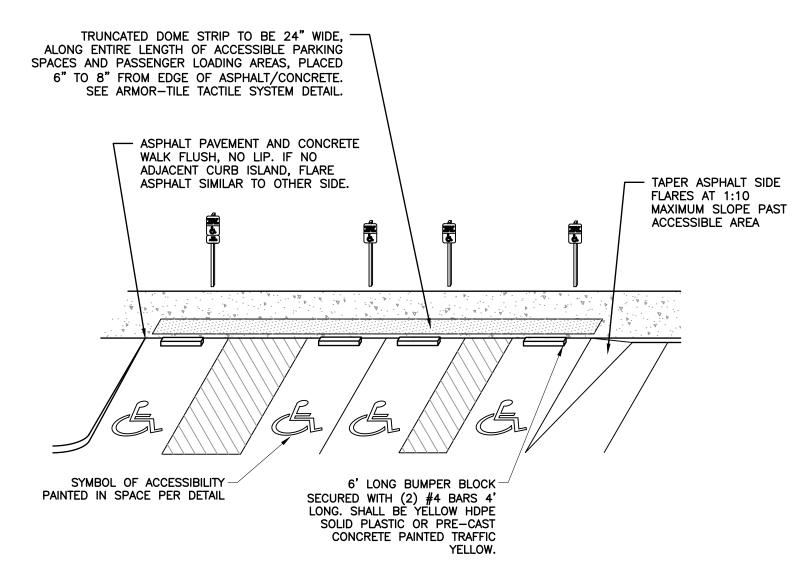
ADA ACCESSIBLE PARKING SIGNS NOT TO SCALE
